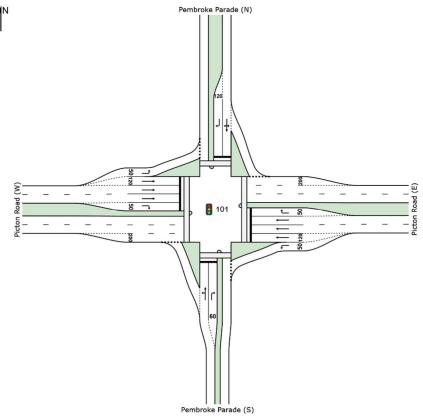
Picton Road / Pembroke Parade intersection, alternate layout
